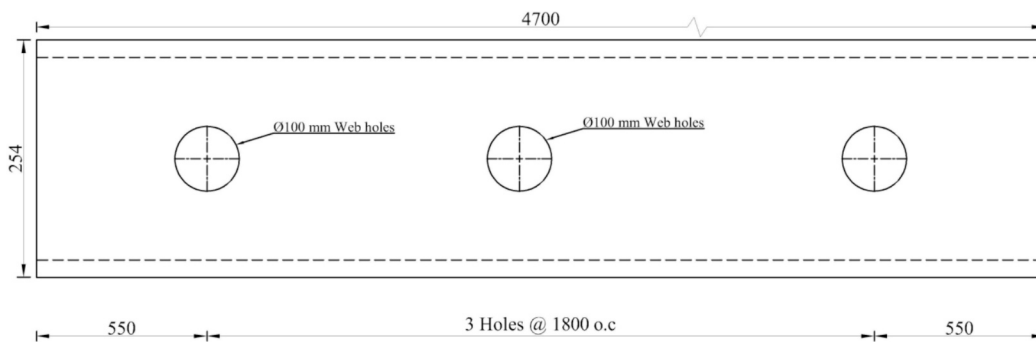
Details of web openings (location and size) drilled through the joist's web (all dimensions are in mm).
